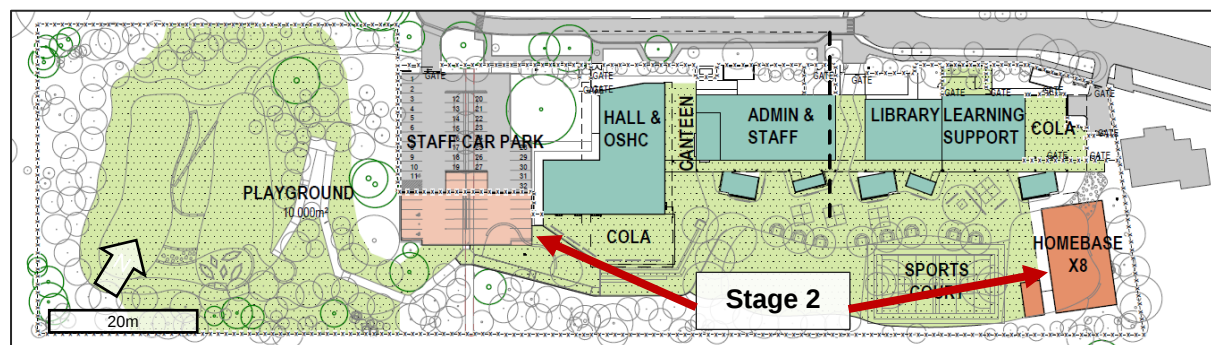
| Concept Stage 2 site layout (Source: Applicant's RtS 2021)
